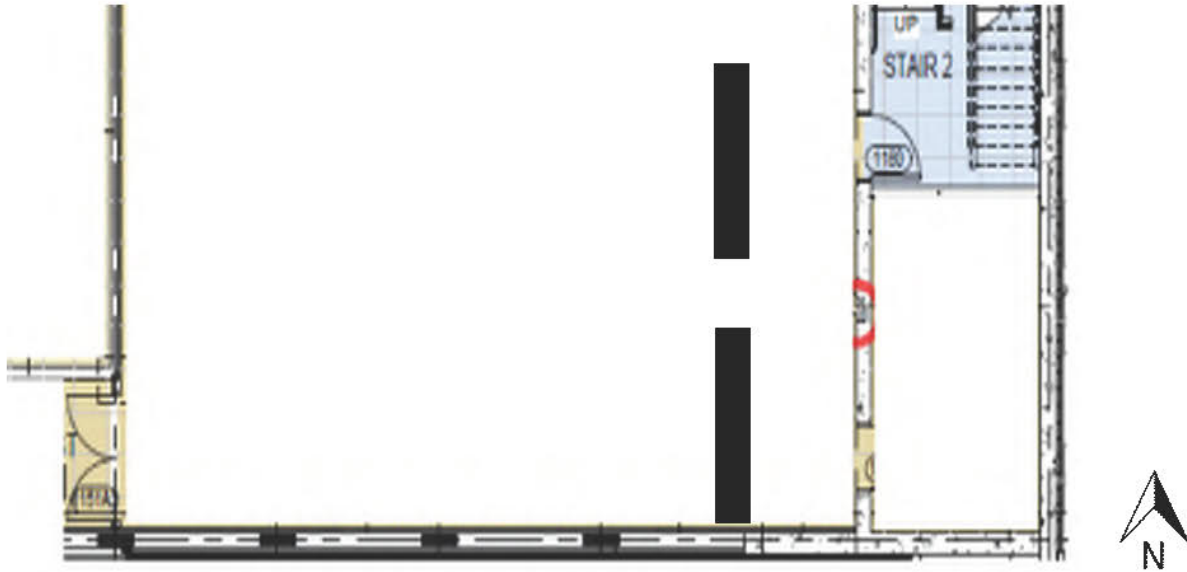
LW-A permutation at BC Hydro Theatre (18 living wall panels mounted on 2-3X3 steel frames) (Drawing retrieved from Busby Perkins + Will Architectural drawings, 2009).
